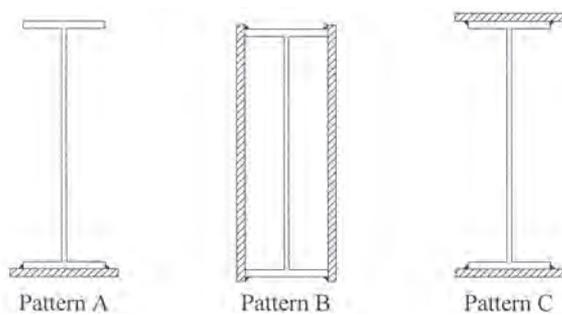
Placement of reinforcing plates for W12 × 19 beams to be tested under load (courtesy of Professor Yi Liu).
